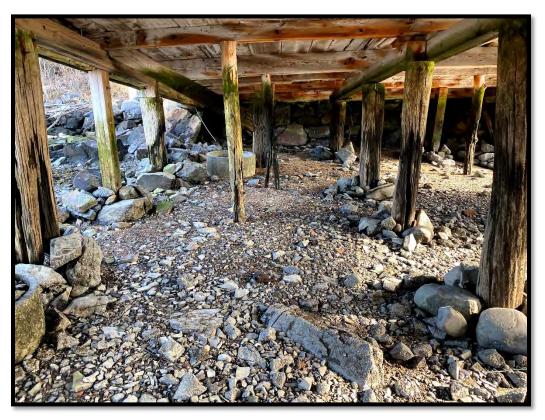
Existing Pilings and Stilts under Existing Boat House Pier. Facing North from Underneath Boat House.
